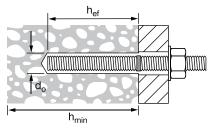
Hilti HAS/HIT-V threaded rod installation conditions
